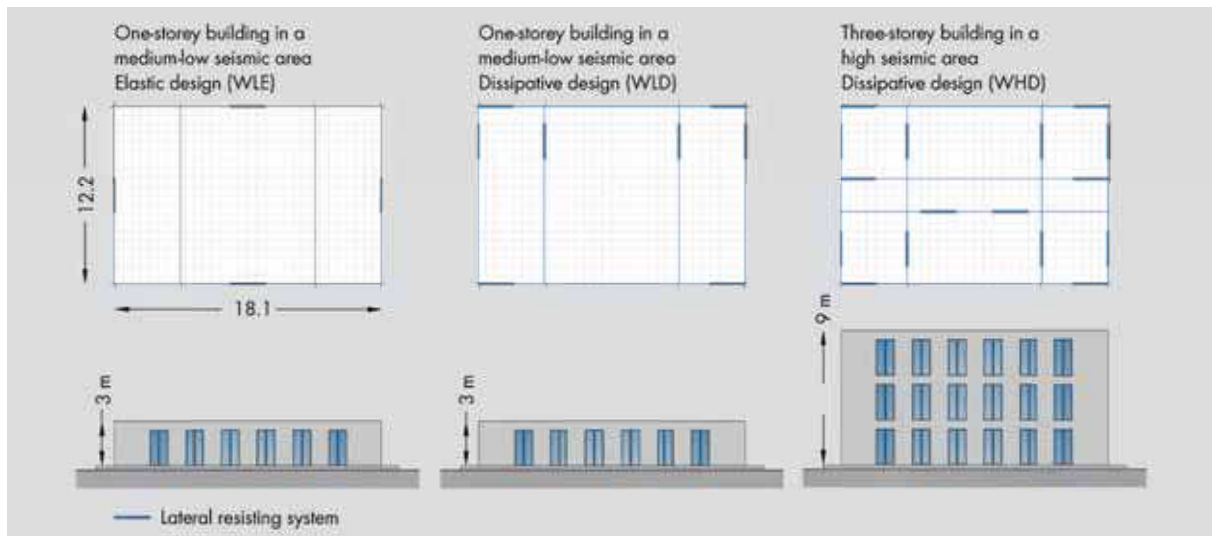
Plan and elevation of the three case studies with wall resisting systems highlighted
